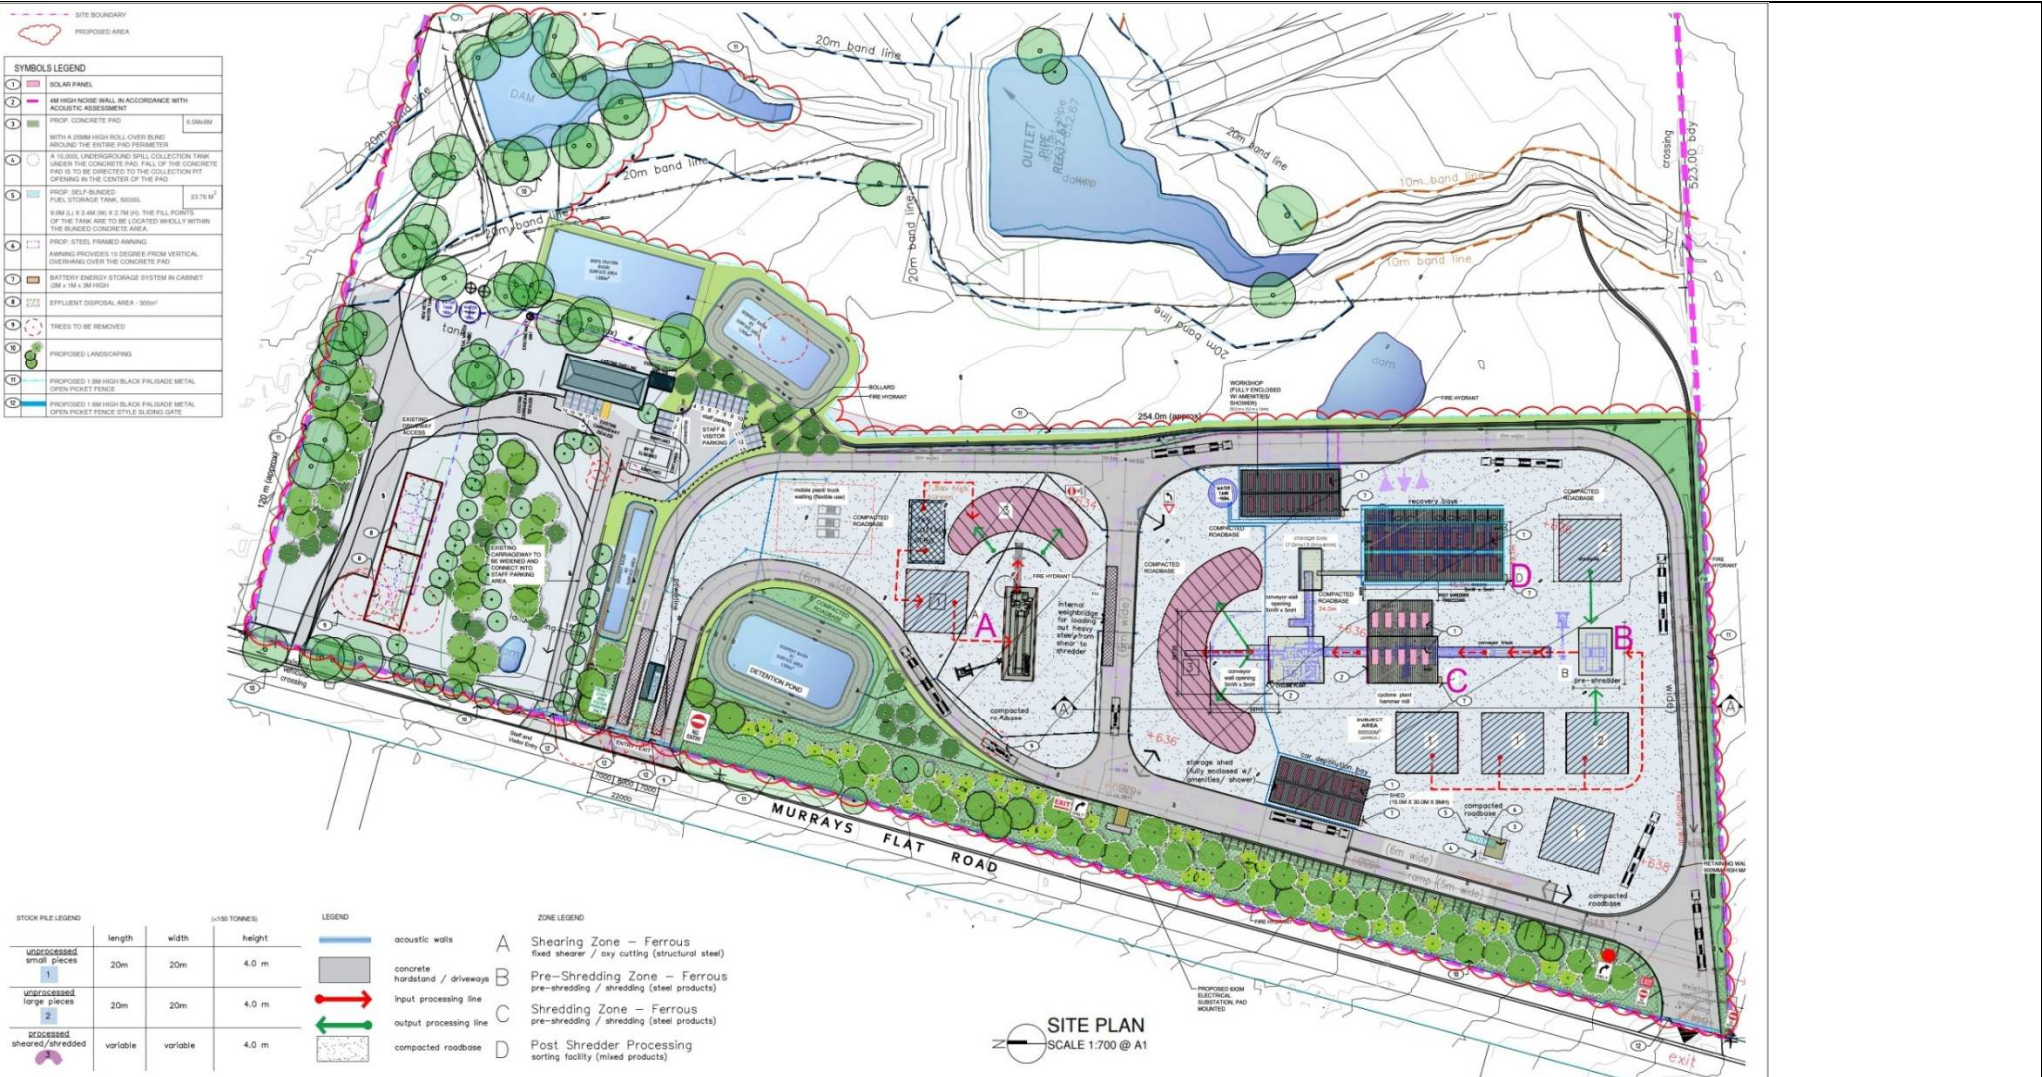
Proposed concept plan outlining the location for the Metal Recycling Facility.
